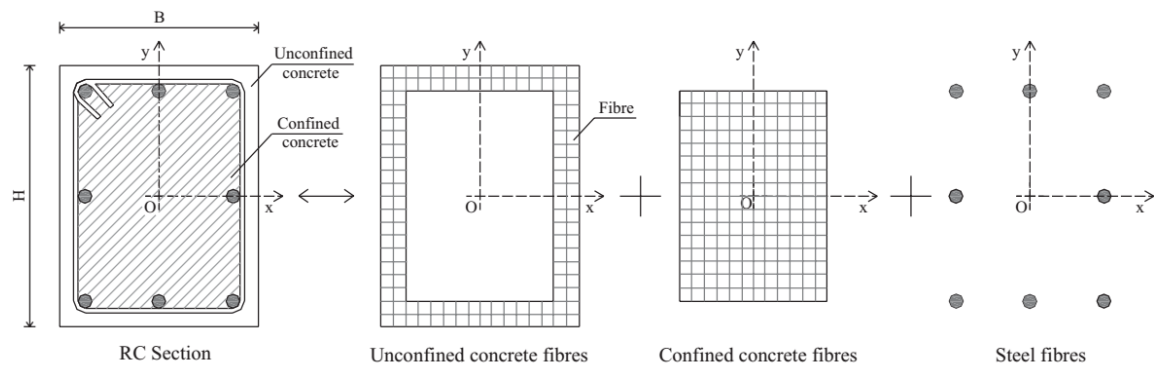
Typical Fiber model of a reinforce concrete column section
